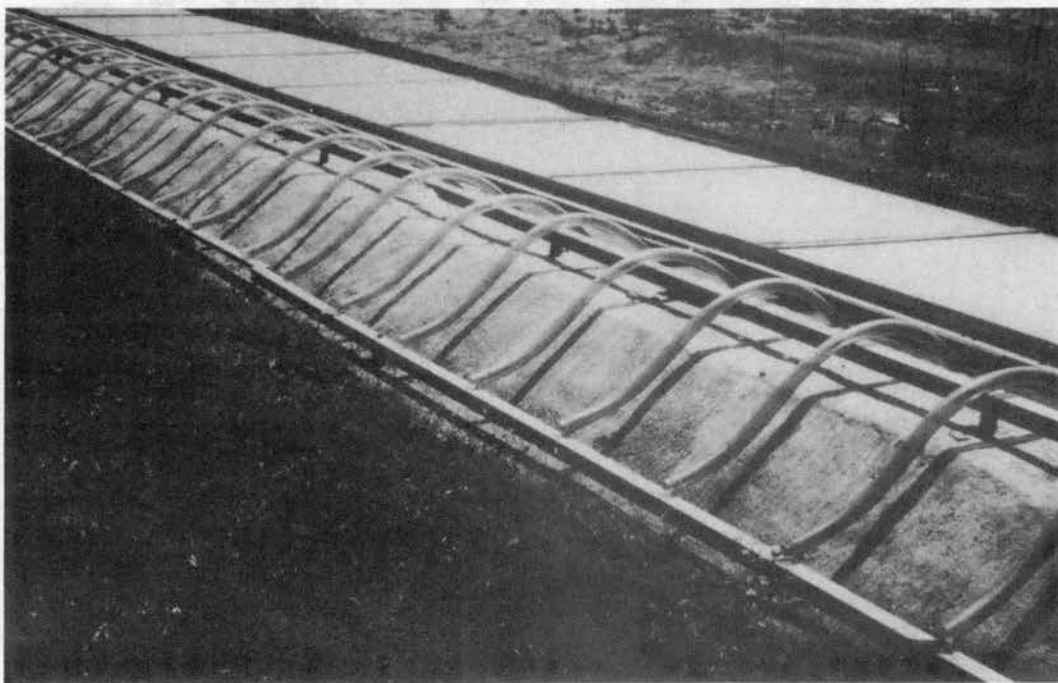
Siphon Tube Outlets Placed at the Reference Elevation, with Wind Panels Installed in the Background.
